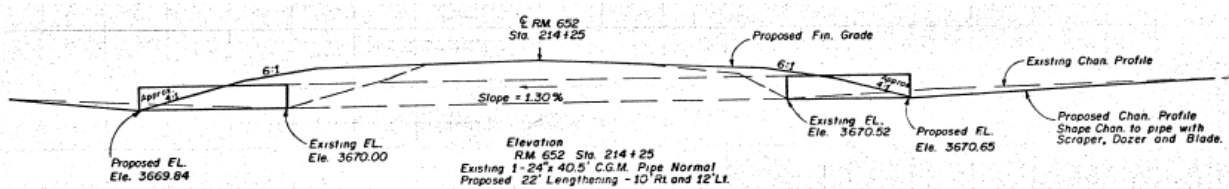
1970 Plan Detail for Culvert at STA 214+25.
